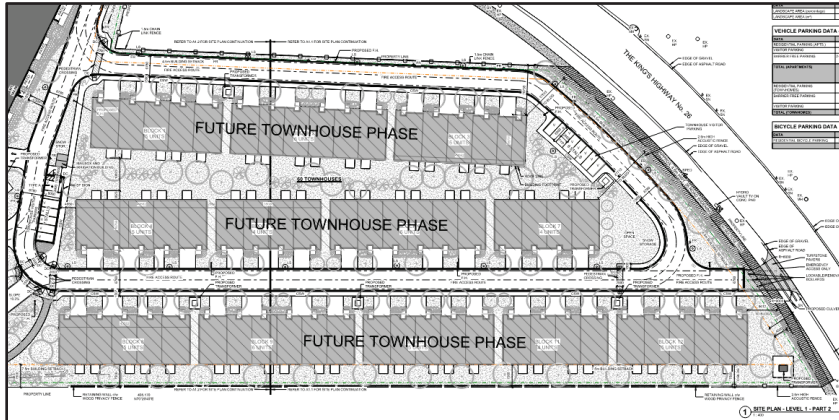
Previously approved site plan excerpt showing "future townhouse phase" label on the east side of the subject lands.
